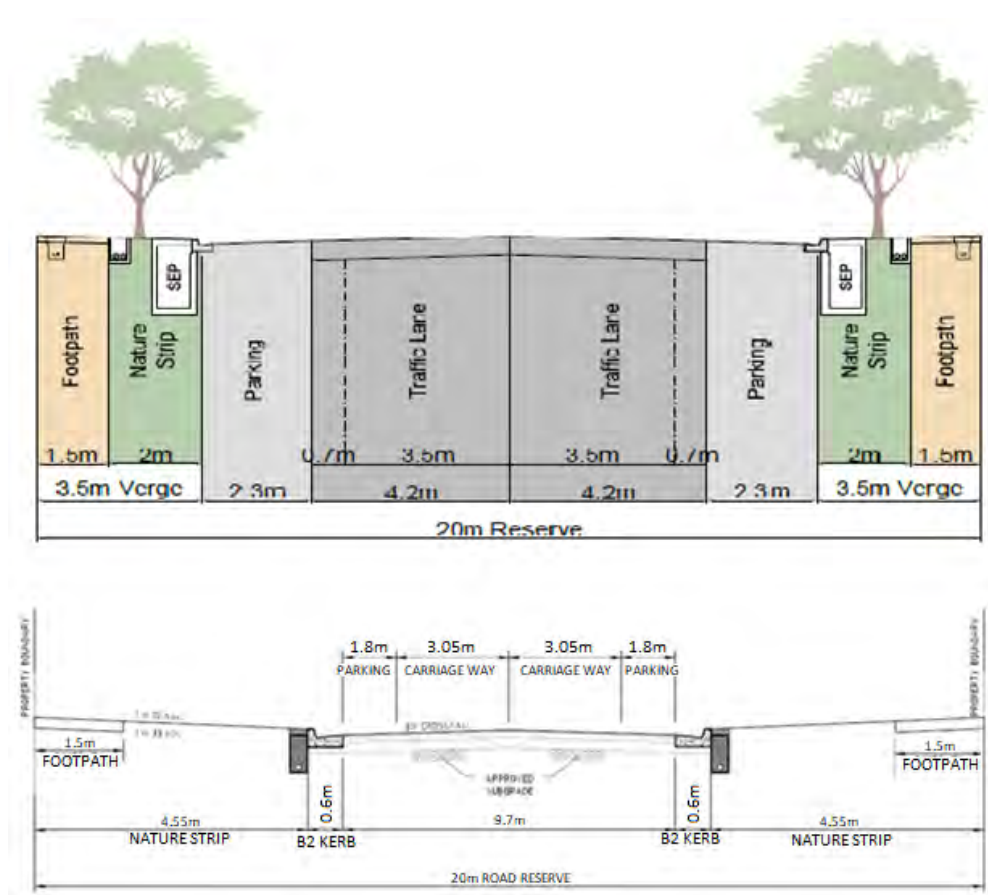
Collector Street: Constrained and Key Access Street cross sections
